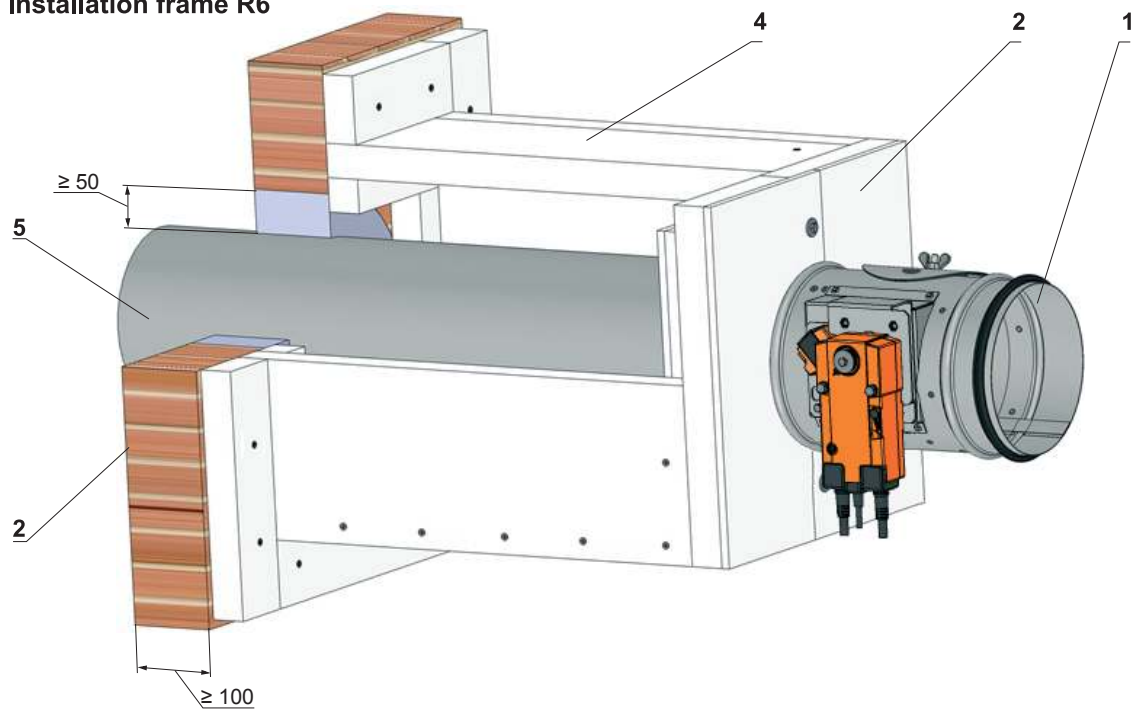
Installation outside of solid wall construction - installation frame with cement lime plates
